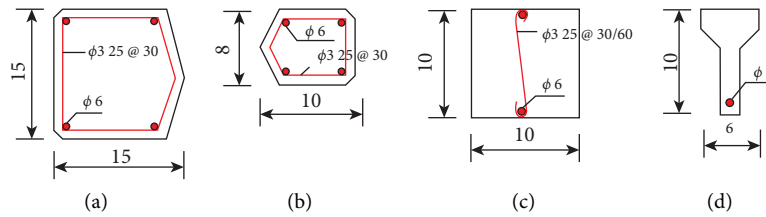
Detailed geometric dimensions and rebar arrangement of the concrete sections (in cm): (a) A-A; (b) B-B; (c) C-C; and (d) D-D sections.
